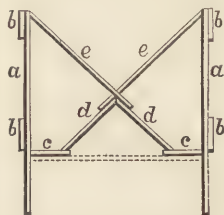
Section of Sheep Rack—Height, 37 inches; width, 31 in.; a, space 12 in. wide; b b, 6 in.; c c, 7 in.; d d, 10 in.; e e, $2\frac{1}{4}$ in. wide and 22 in. long.
